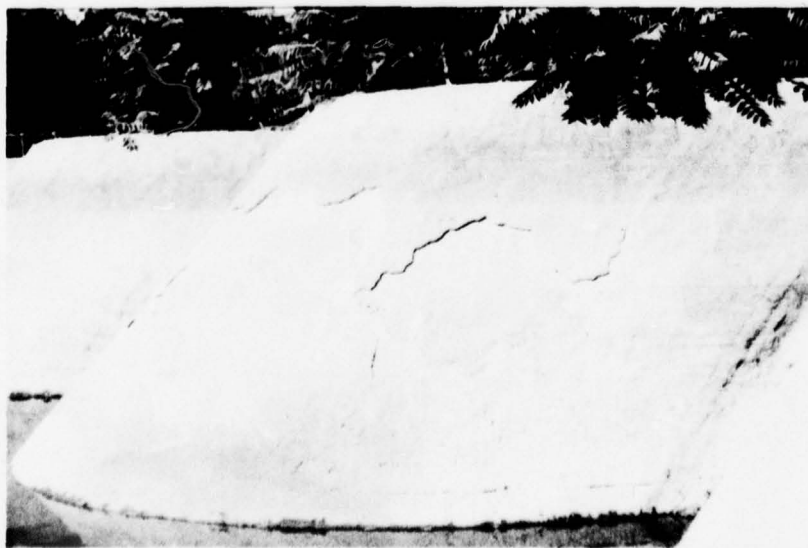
View of spalled gunite on upstream surface of dam.
